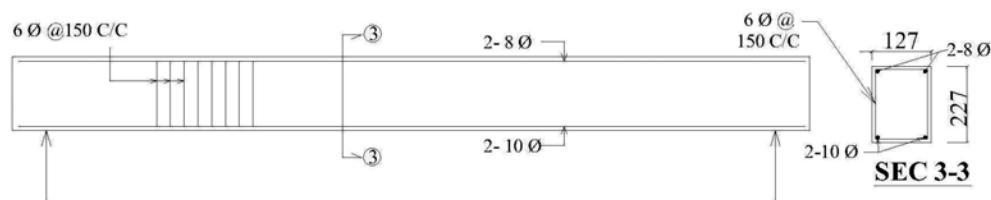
Longitudinal and Cross-Section of Unretrofitted Under Reinforced Beams
